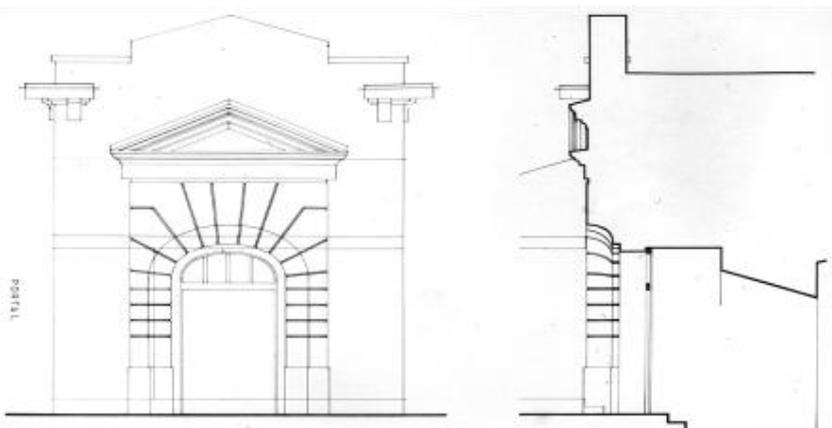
Details from restauration Plan for Fortress (part of the wall with the eastern gate)
